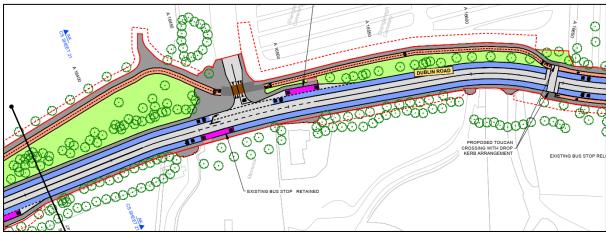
Extract from General Arrangement Drawing at Shanganagh Park/ Cemetery (Sheet 47)
